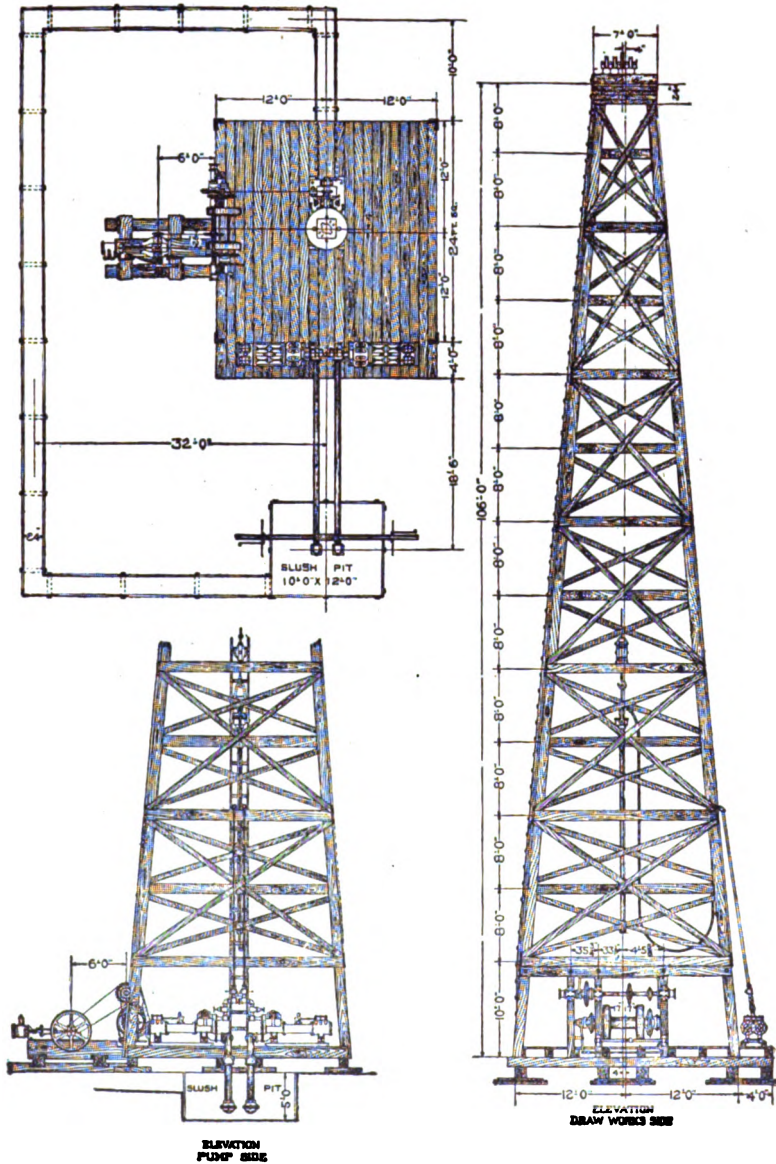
Side elevation and ground plan of 106-foot California rotary drilling rig with extra wind braces, showing machinery installed ready for drilling.
